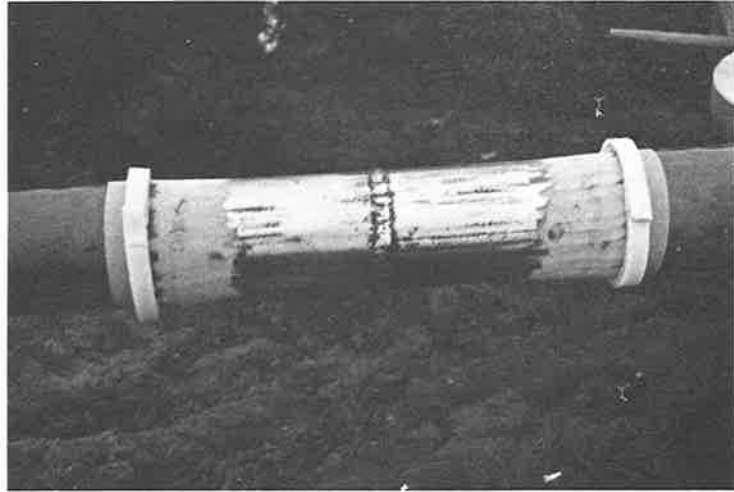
Cleaned surface for the insulation of a circumferential weld
